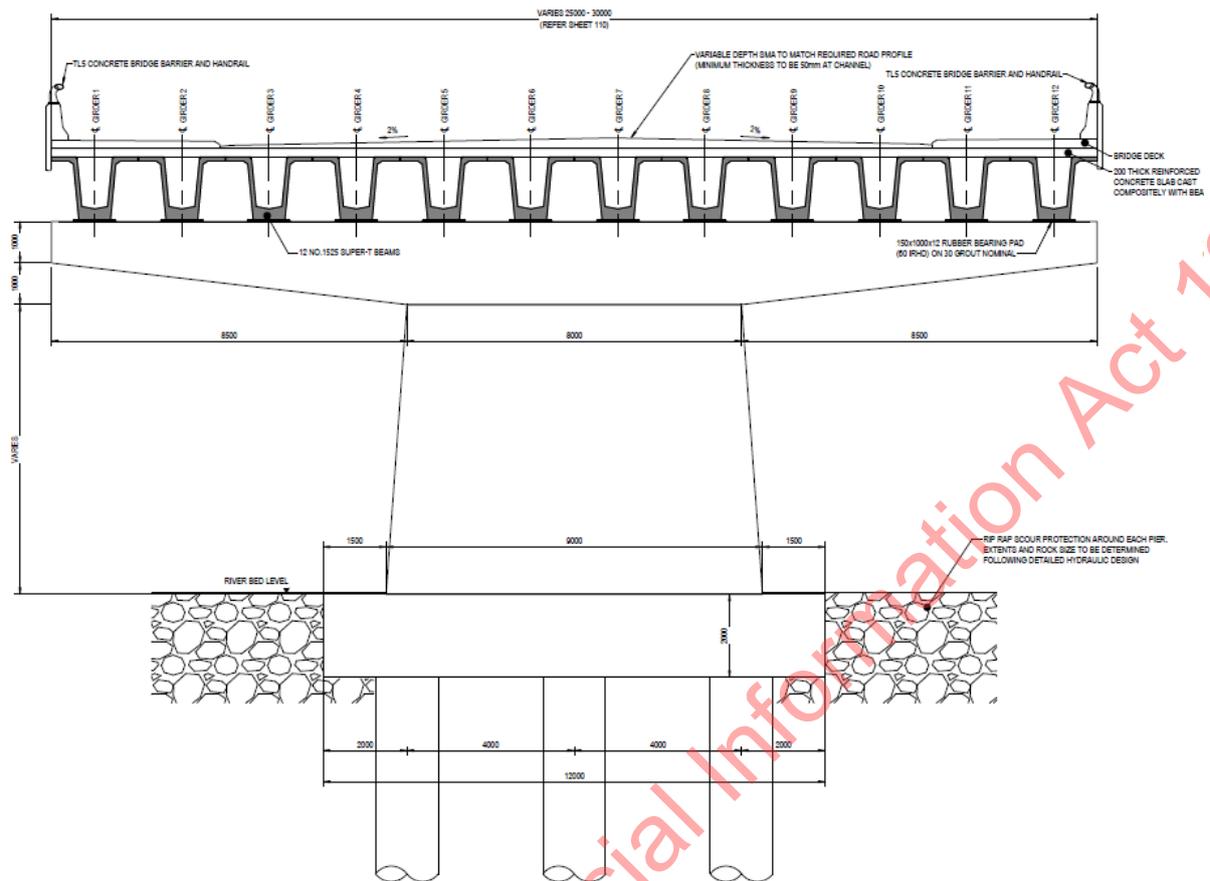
Proposed Hutt River Bridge typical cross-section at pier
